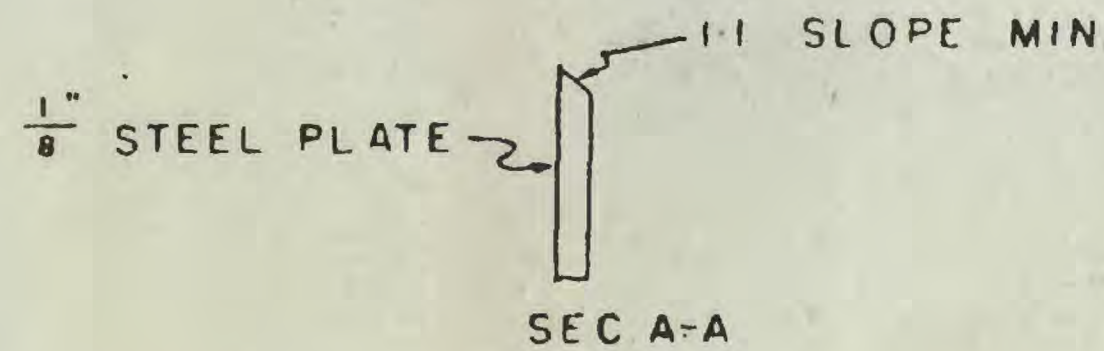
DETAIL OF WEIR PLATE FOR SHEET NO. 1
